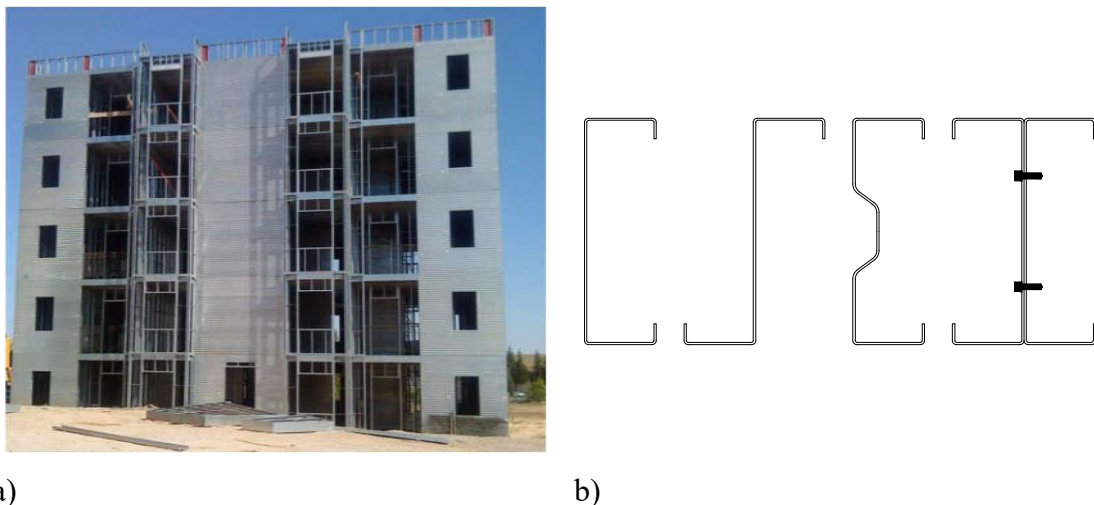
a) Photograph of CFS framed residential building located in Setif, Algeria (photo credit: ALRIM), b) drawing of common CFS cross-sections.
